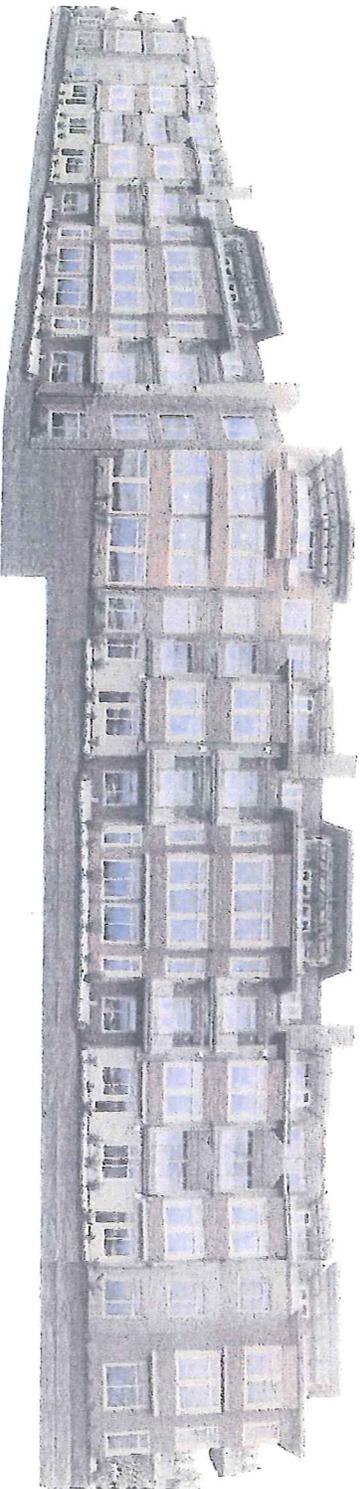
PHOTO COMPOSITE OF PROPOSED BUILDING 10 - ORIGINAL PLAN
